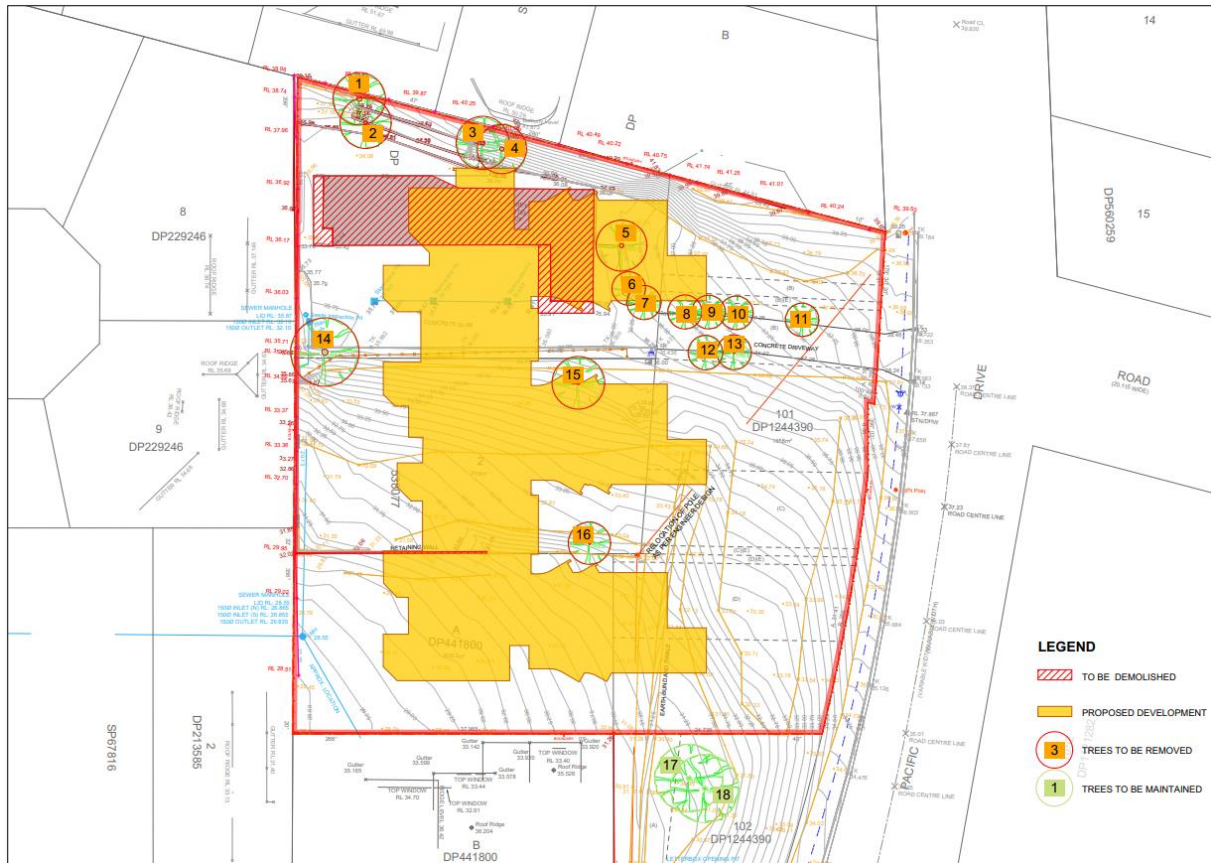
Proposed Demolition, Tree Removal & Building Footprint Plan Extract
